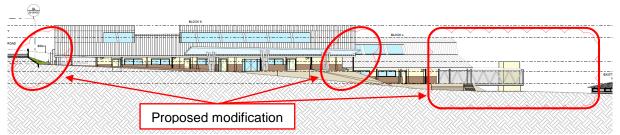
| Proposed western elevation (Source: Applicant's Modification Application 2020)
